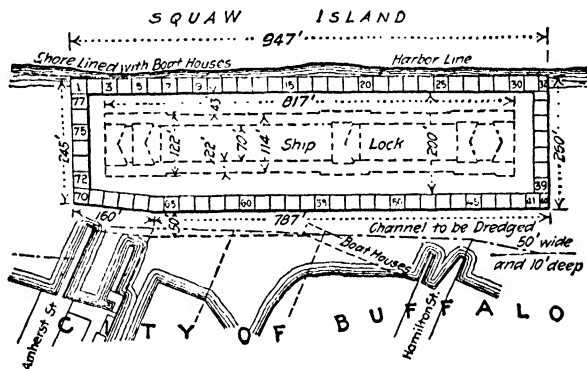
Plan of Black Rock Cofferdam.
